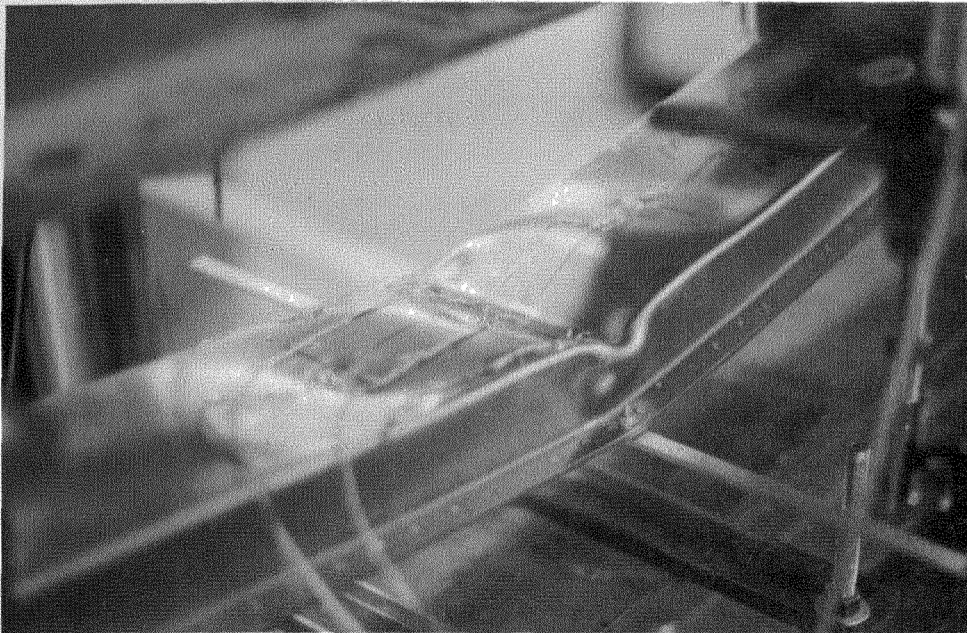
Typical Failure of a Beam with Large w/t Ratio
